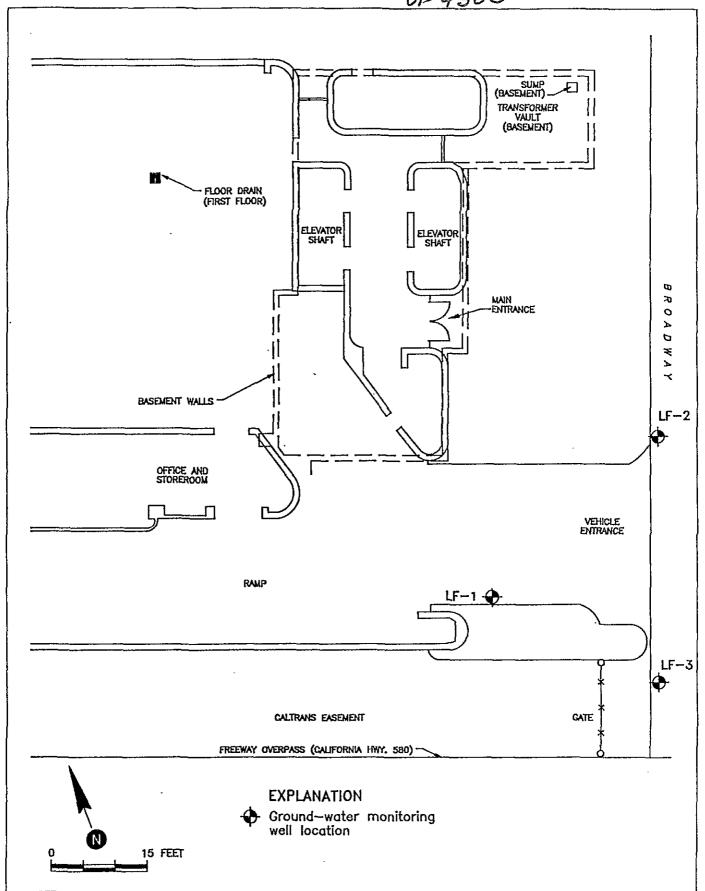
SITE PLAN AND MONITORING WELL LOCATIONS
